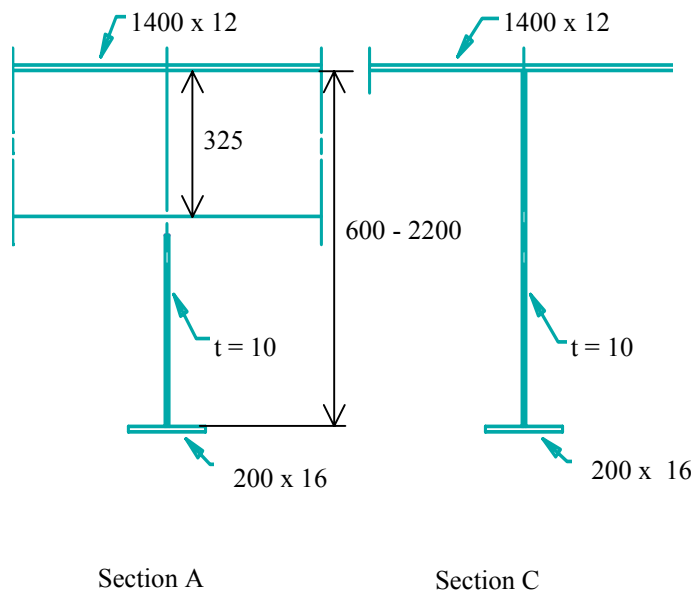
Cross sections of investigated crossbeams (Dimensions in mm)
